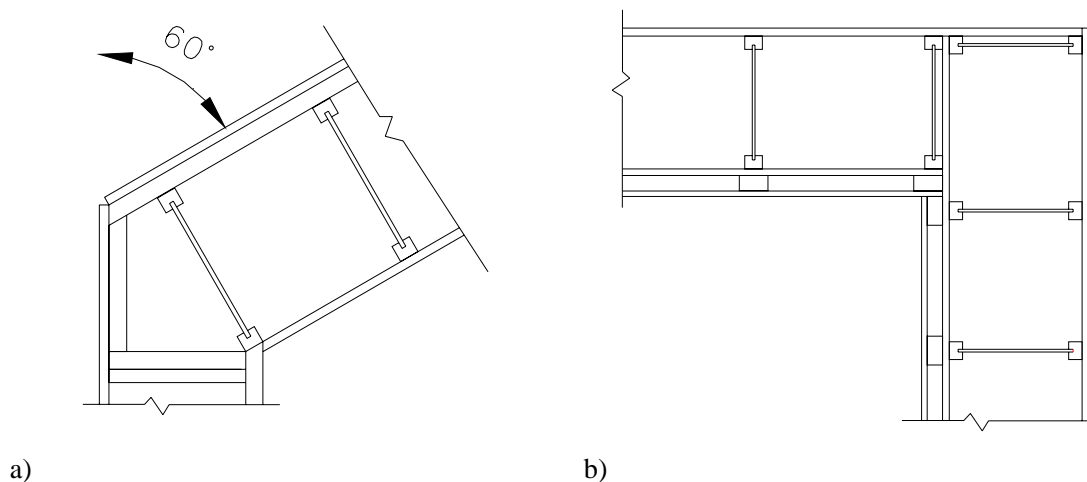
(a) Wall-to-roof connection (30°) of the wind barrier in the West and East façade (21 m) (b) connections between the walls (90°).
